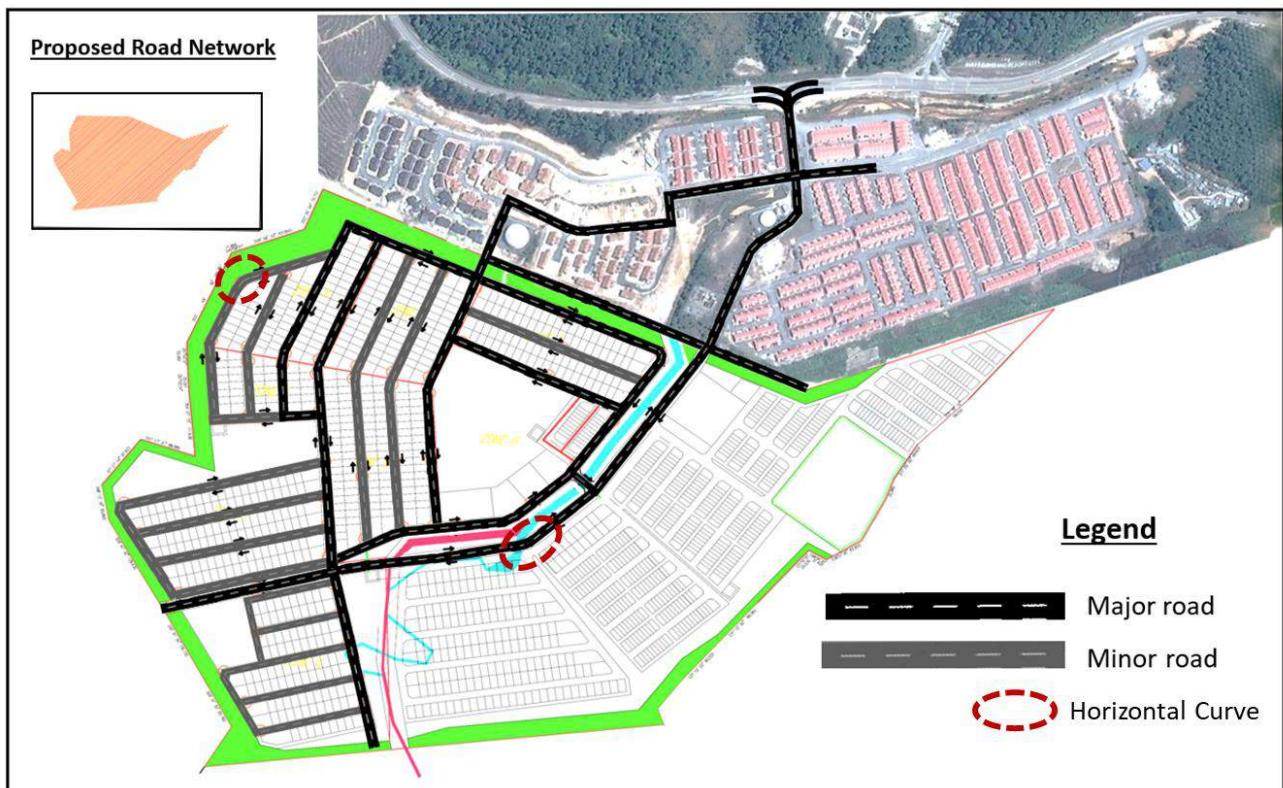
Proposed Layout of Road Network with points of Horizontal alignment
